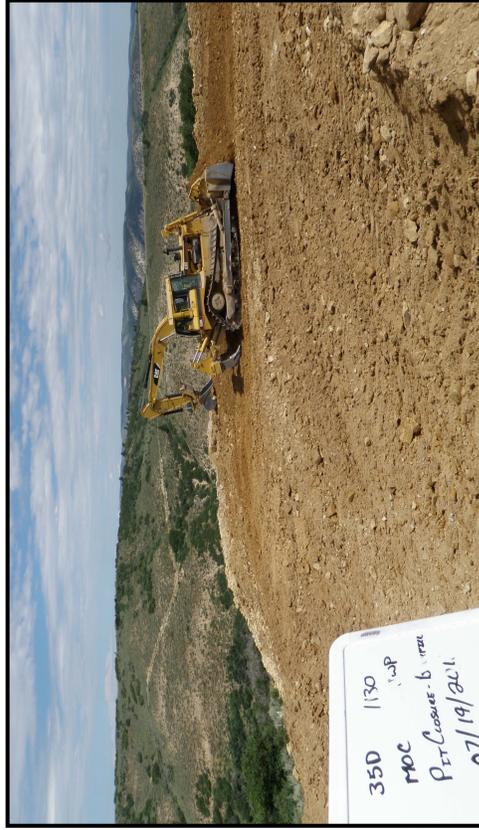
D8 and track hoe backfilling pit and beginning to contour slopes.
